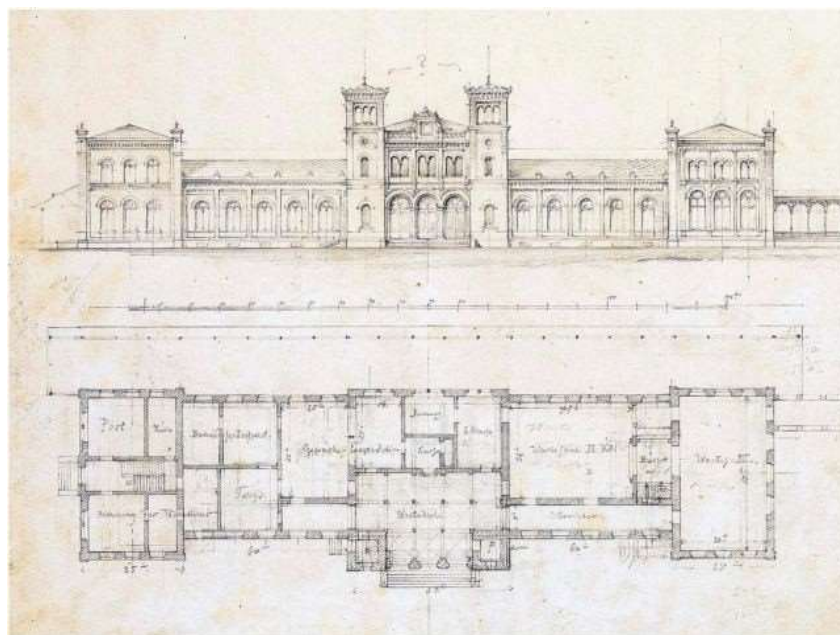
South-west elevation and ground floor plan, drawings Carl Lüdecke, 1868, [10]
